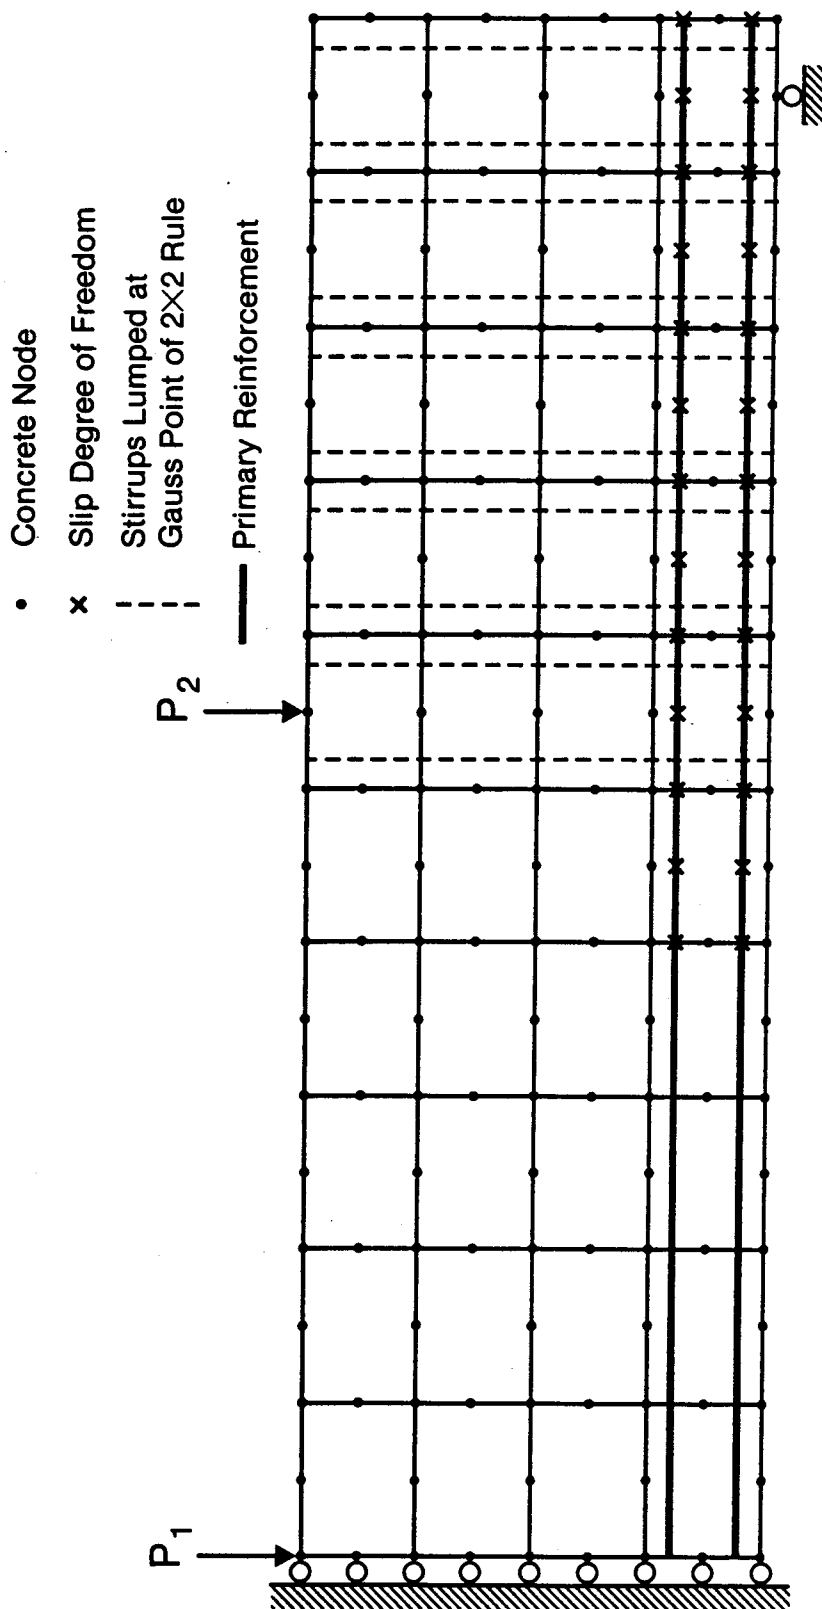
Typical Finite Element Model of a Reinforced Concrete Beam
